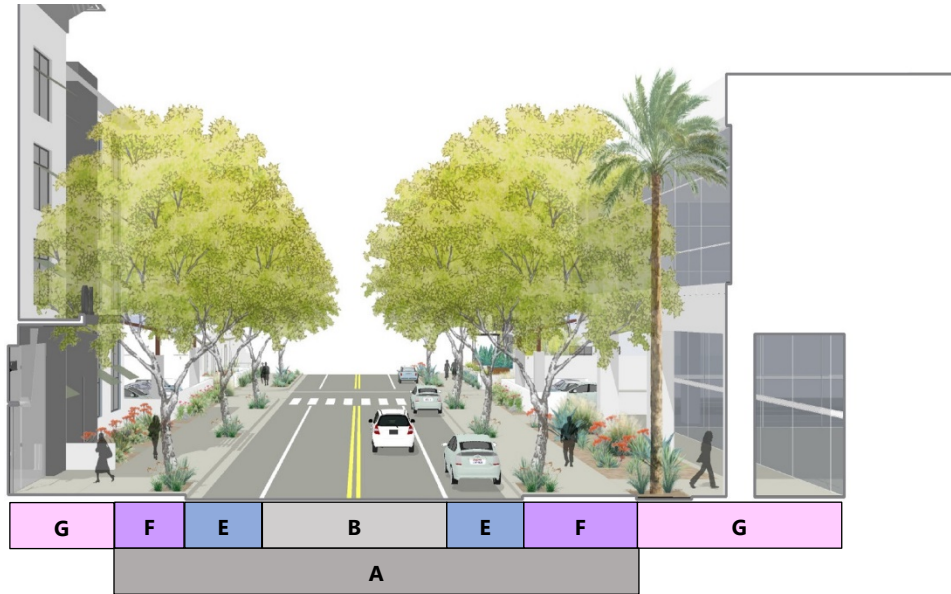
, Typical Commercial Street (DC/DG Zone)
